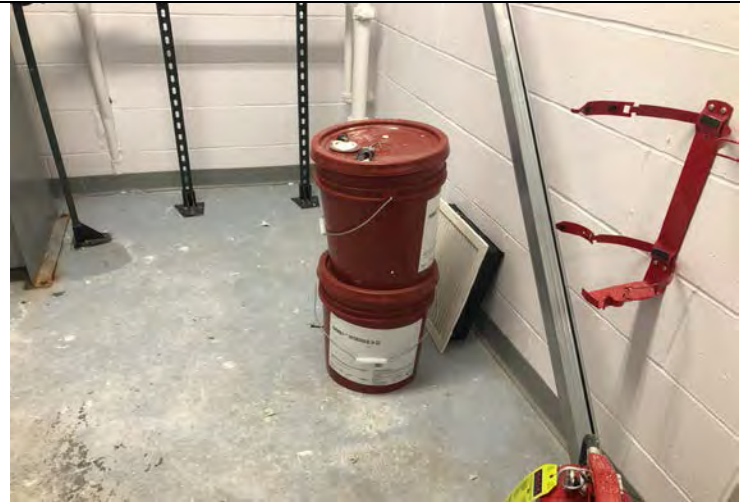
Two 5-gallon buckets of Humble Hydraulics H 32 hydraulic oil in the new vocational agricultural elevator machine room.
